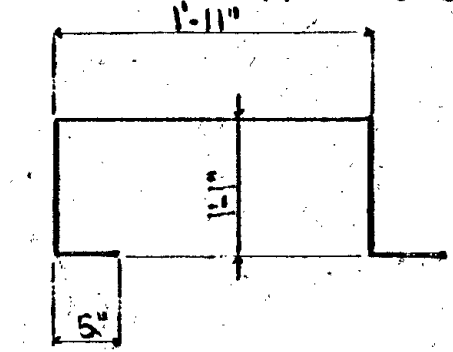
DETAIL OF BOX DRAINS 32 REQ'D THUS BOX DRAINS TO BE AS PER M.H.D. STD. PLT. NO 8138
